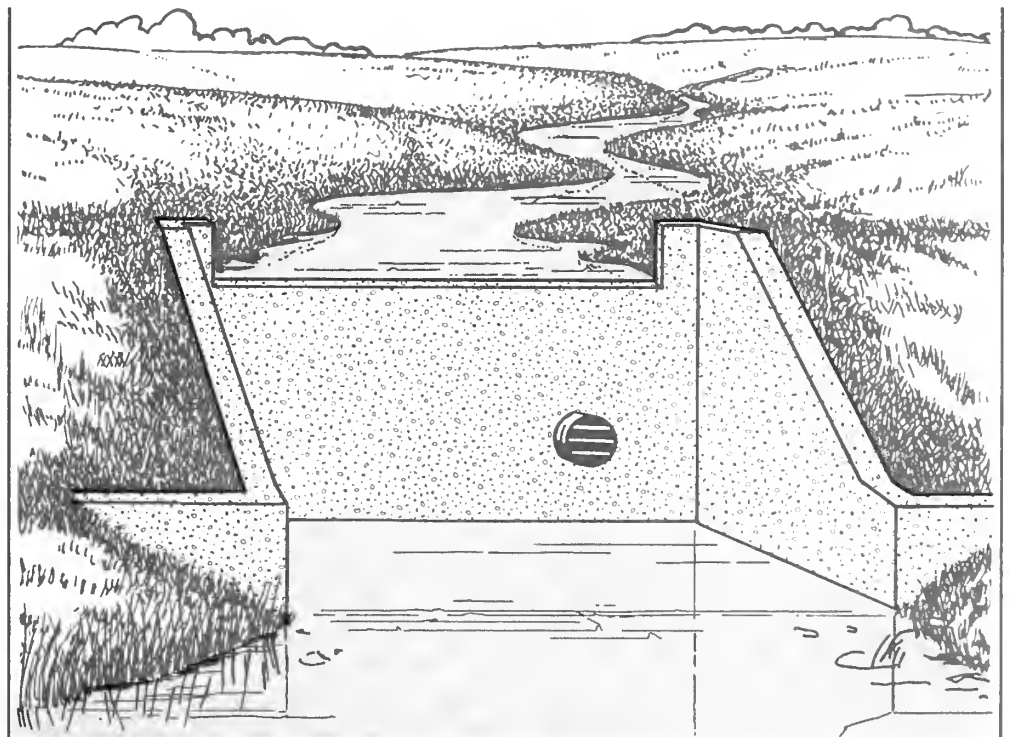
Straight drop spillway used to protect subsurface drain entering channel.
